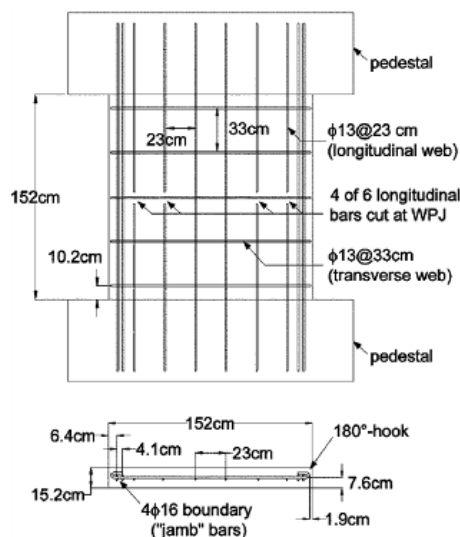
Wall Spandrel Geometry and Reinforcement (Massone *et al.*, 2009).
